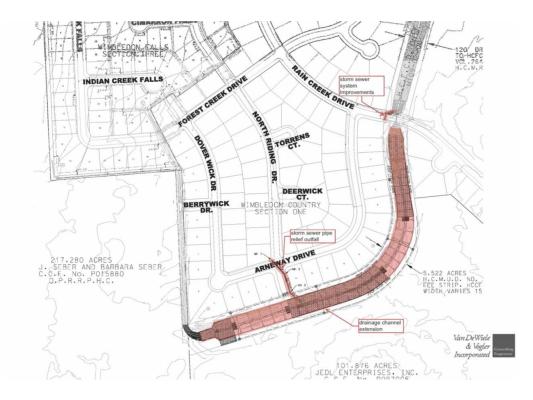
Drainage improvement project consisting of an extension of the existing drainage channel, a storm sewer relief pipe with outfall to the extended drainage channel, larger inlets and storm sewer pipe on Rain Creek Drive.
